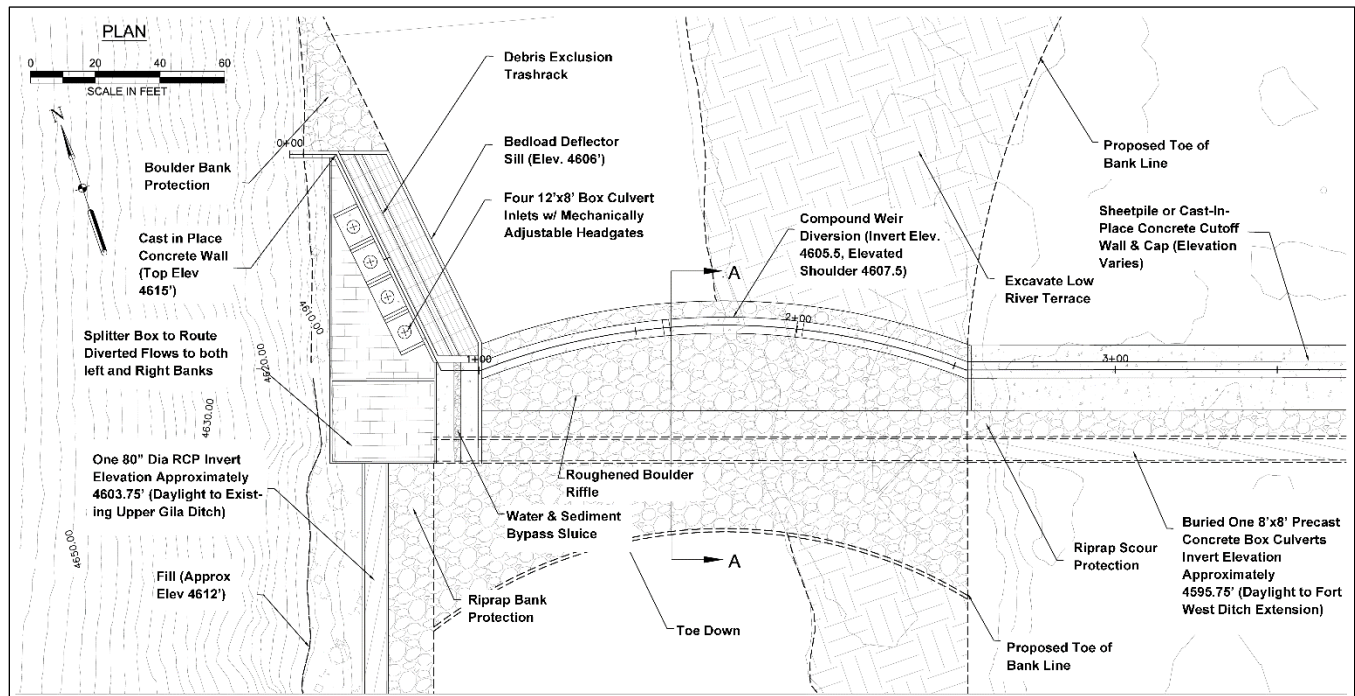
Fixed Crest Weir with Engineered Riffle Rundown - Plan View (excerpted from the Draft Upper Gila Diversion engineering drawings for Cliff-Gila location – Proposed Action)
